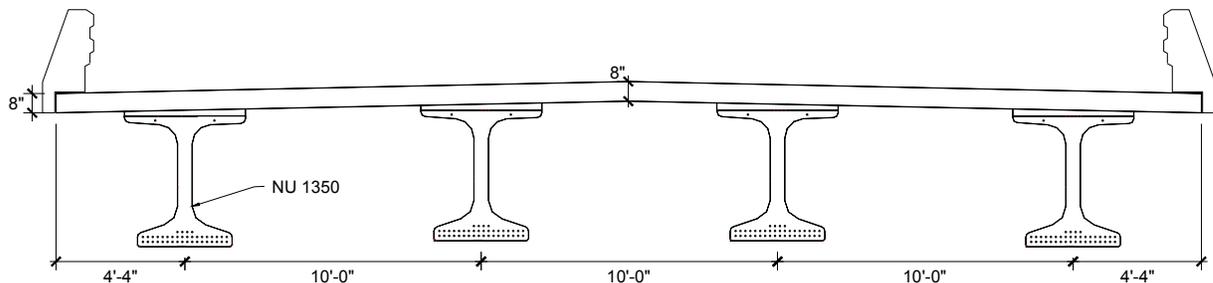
Typical positive moment cross- section of the 176th over I-80 Bridge.
